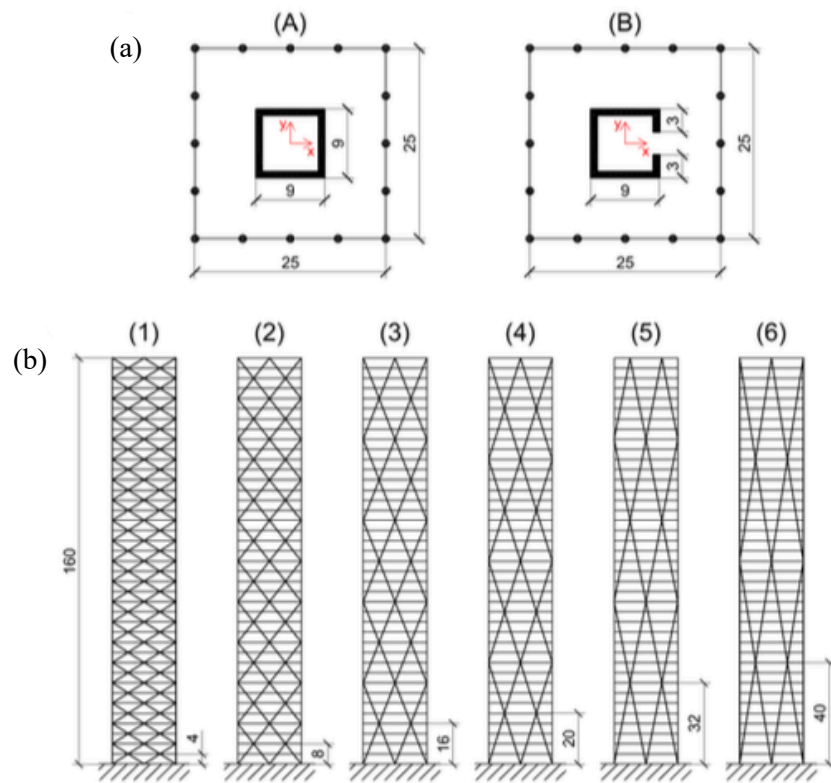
Building geometry: (a) floor plans, (b) lateral views. Used with permission from Lacidogna et al. [129].
